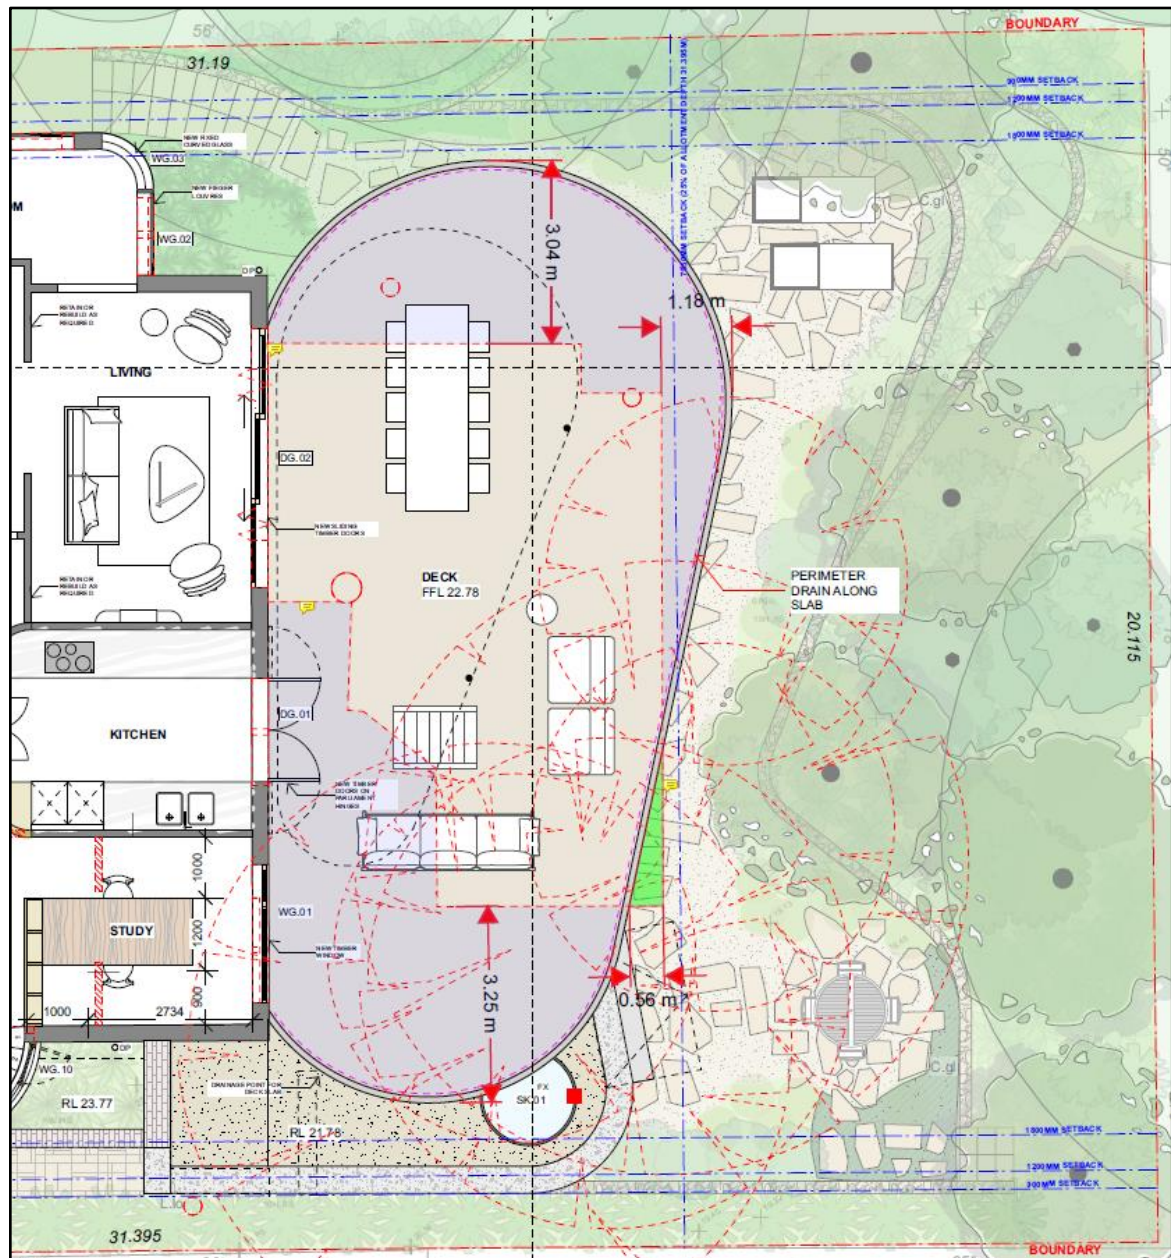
Ground floor plan, additional decking compared to the existing is highlighted blue and the reduced decking area is highlighted in green.
